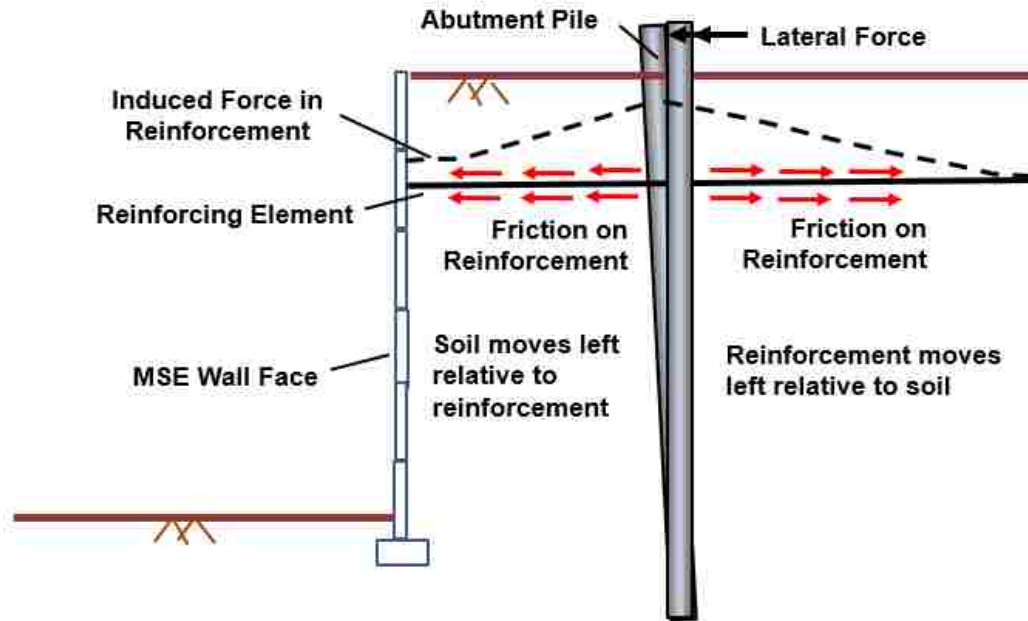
Interaction between MSE wall, soil, and reinforcement.
